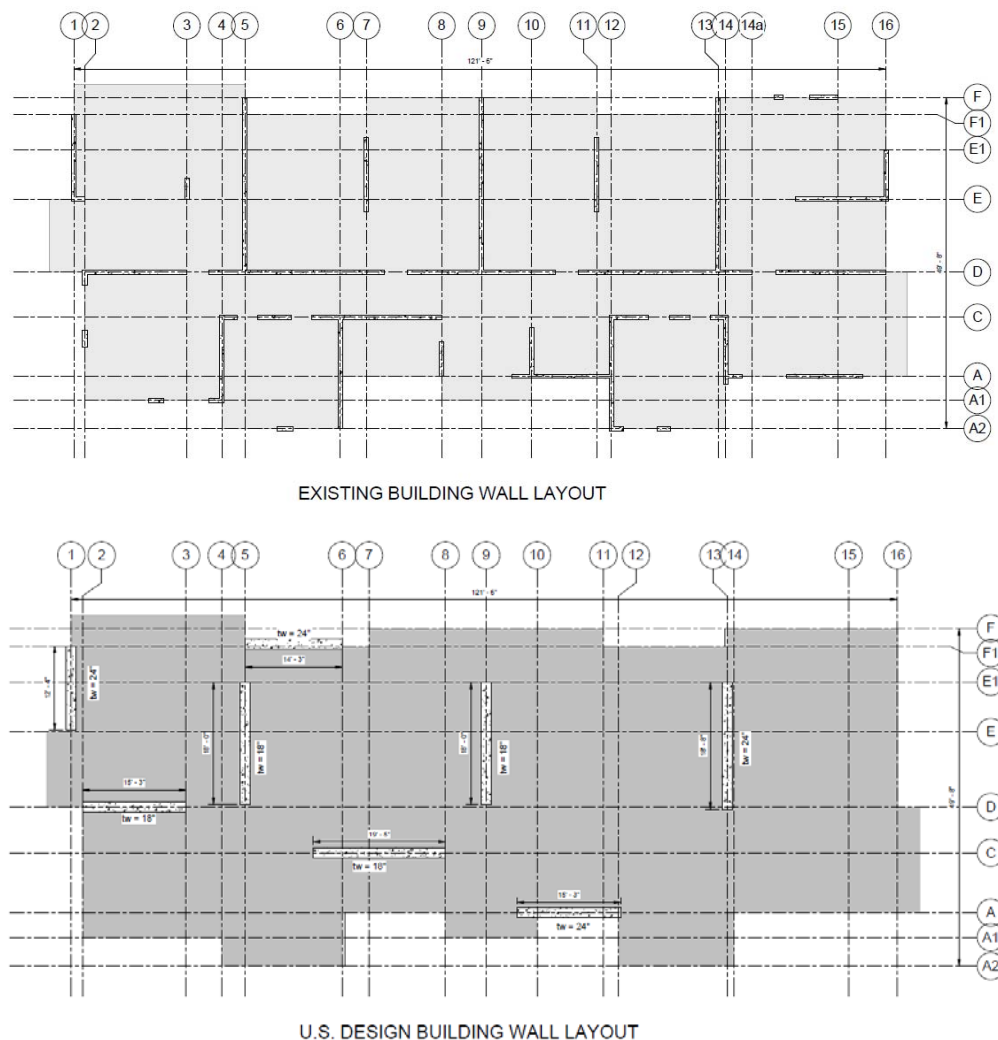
Comparison of U.S. configuration with Chilean shear wall layout.
